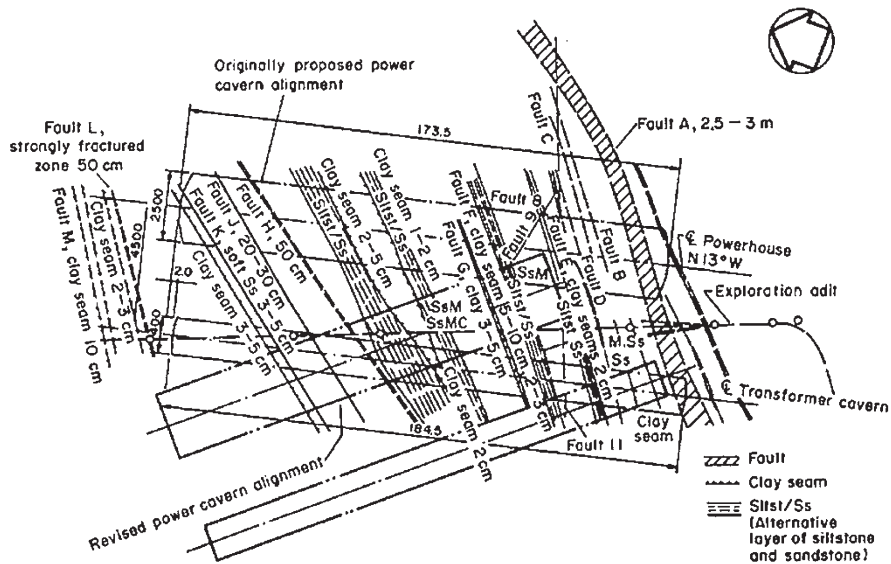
Geological plan of the Mingtan underground powerhouse complex (Hoek 2007a)
